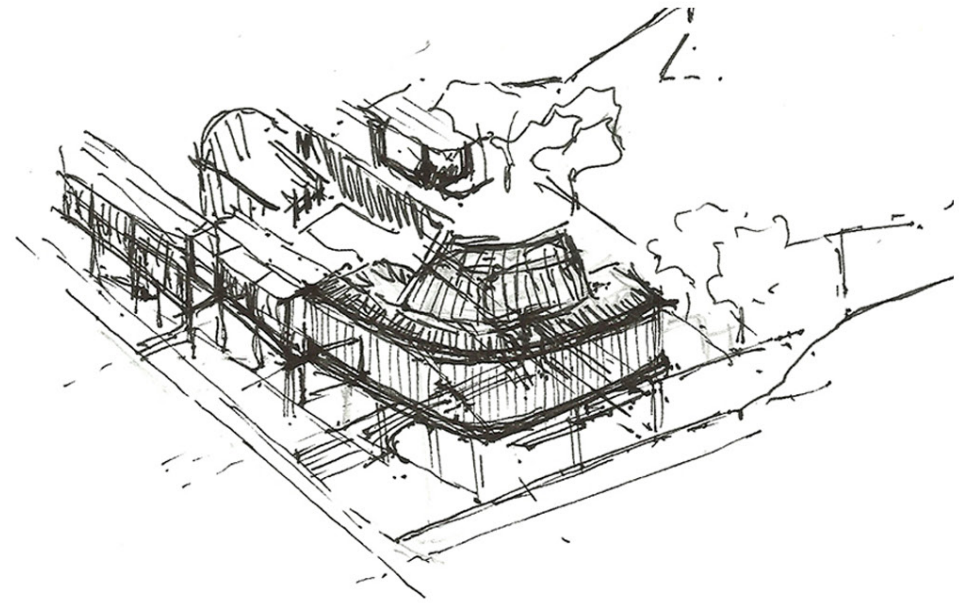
Sketches and photos of model, proposal 3, Author (June 2016)
